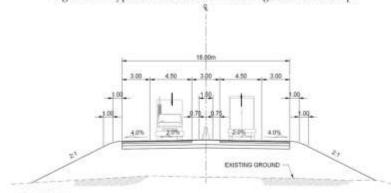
Typical Cross Section Embankment and Cut: Row=60m
